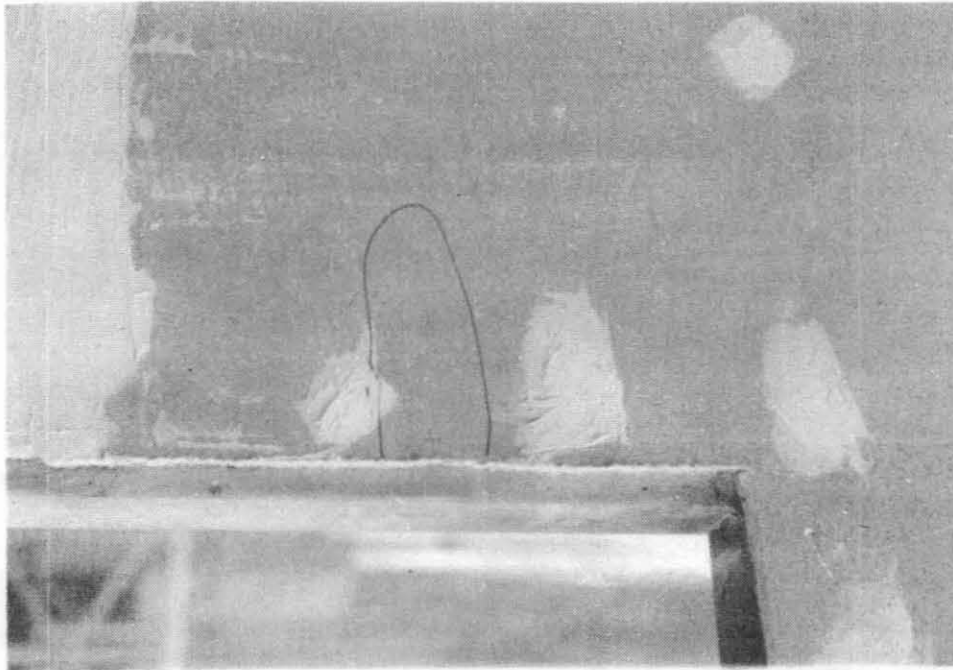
Partition Test Specimen P9: Failure Above Window Opening
